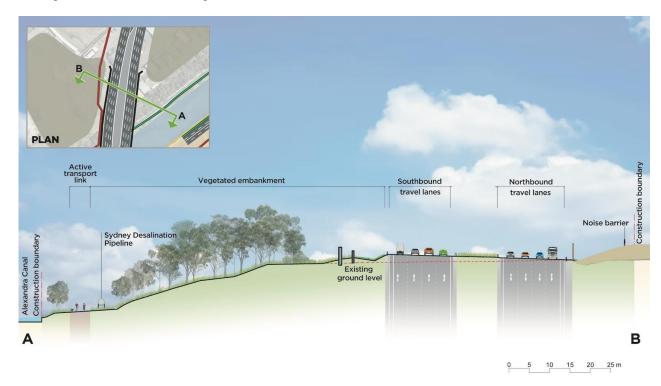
Terminal 1 connection – typical cross-section (looking south)
